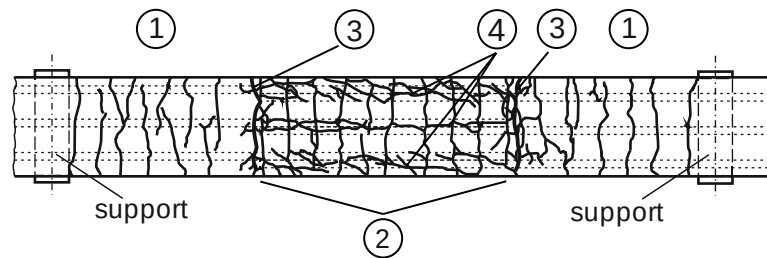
Crack formation of test T2 at the top side of the test specimen
